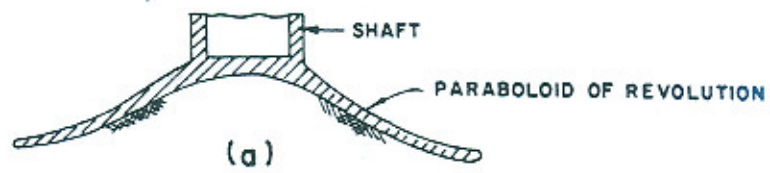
SHELL FOUNDATIONS FOR TOWER-SHAPED STRUCTURES
